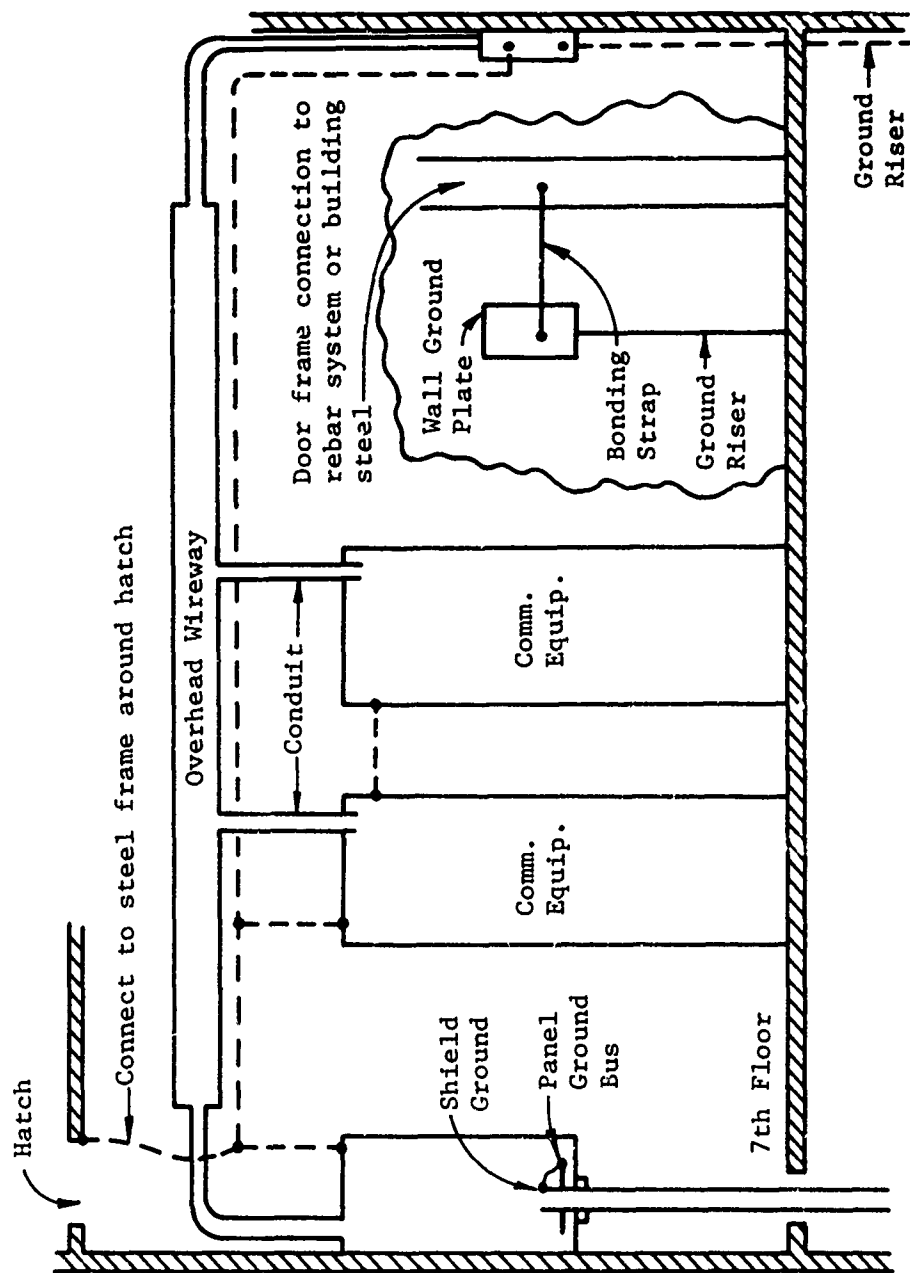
Grounding of equipment racks (grounding arrangement to be used).
